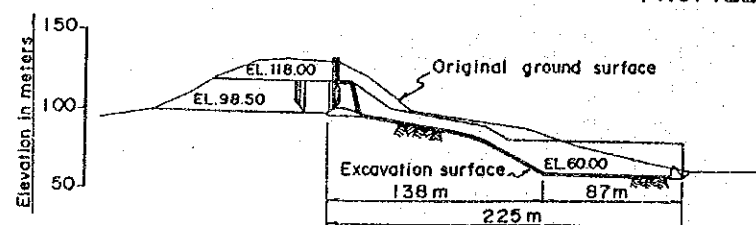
LAYOUT PLAN OF SIFFU NO. 1 DAM
